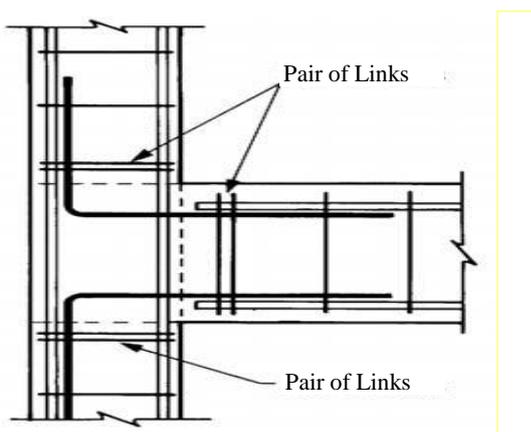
Enhanced Beam-Column connection details for steelwork and Reinforced Concrete
